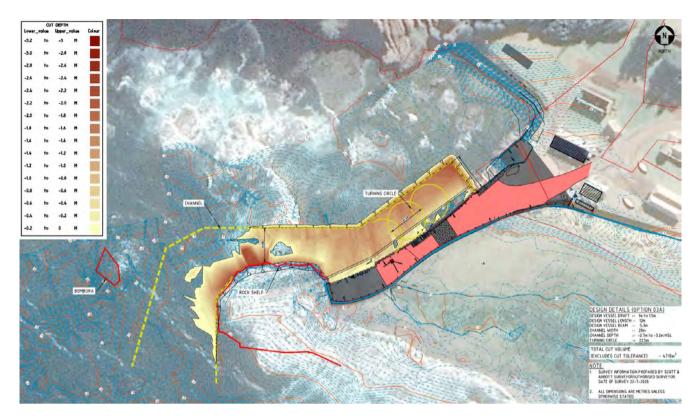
Kingston Pier Channel Construction Cut Plan
